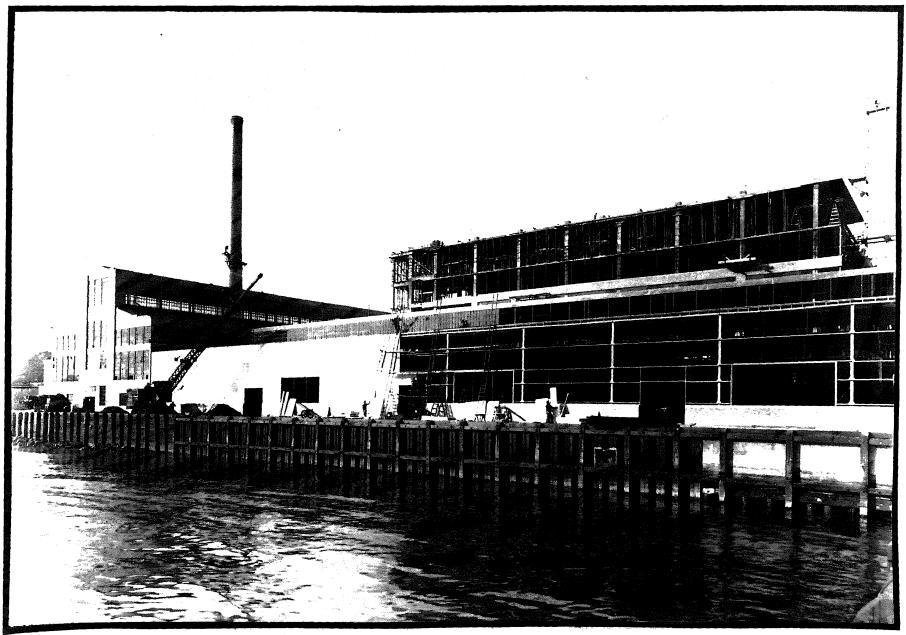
Steel sheet-piling bulkhead (Z-type).
